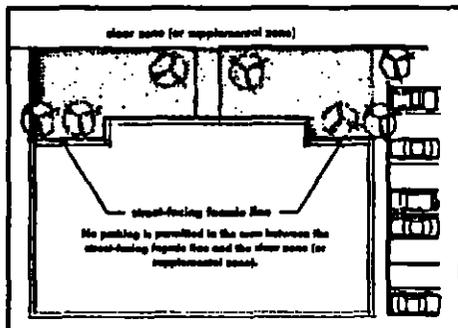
Parking to the side of a building is permitted but screening is required between the parking and the sidewalk. No parking is permitted between the building and the sidewalk on a core transit corridor.
